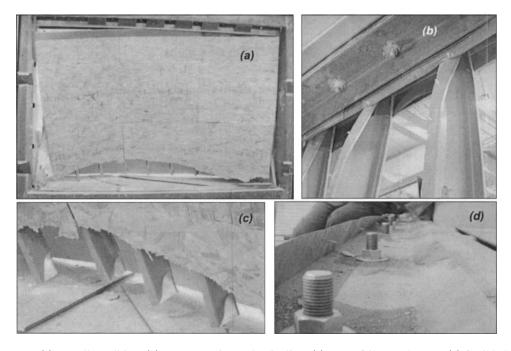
Wall W2 posttest: (a) overall condition; (b) top connection web crippling; (c) screw failure at bottom; (d) flexible bottom track opening
